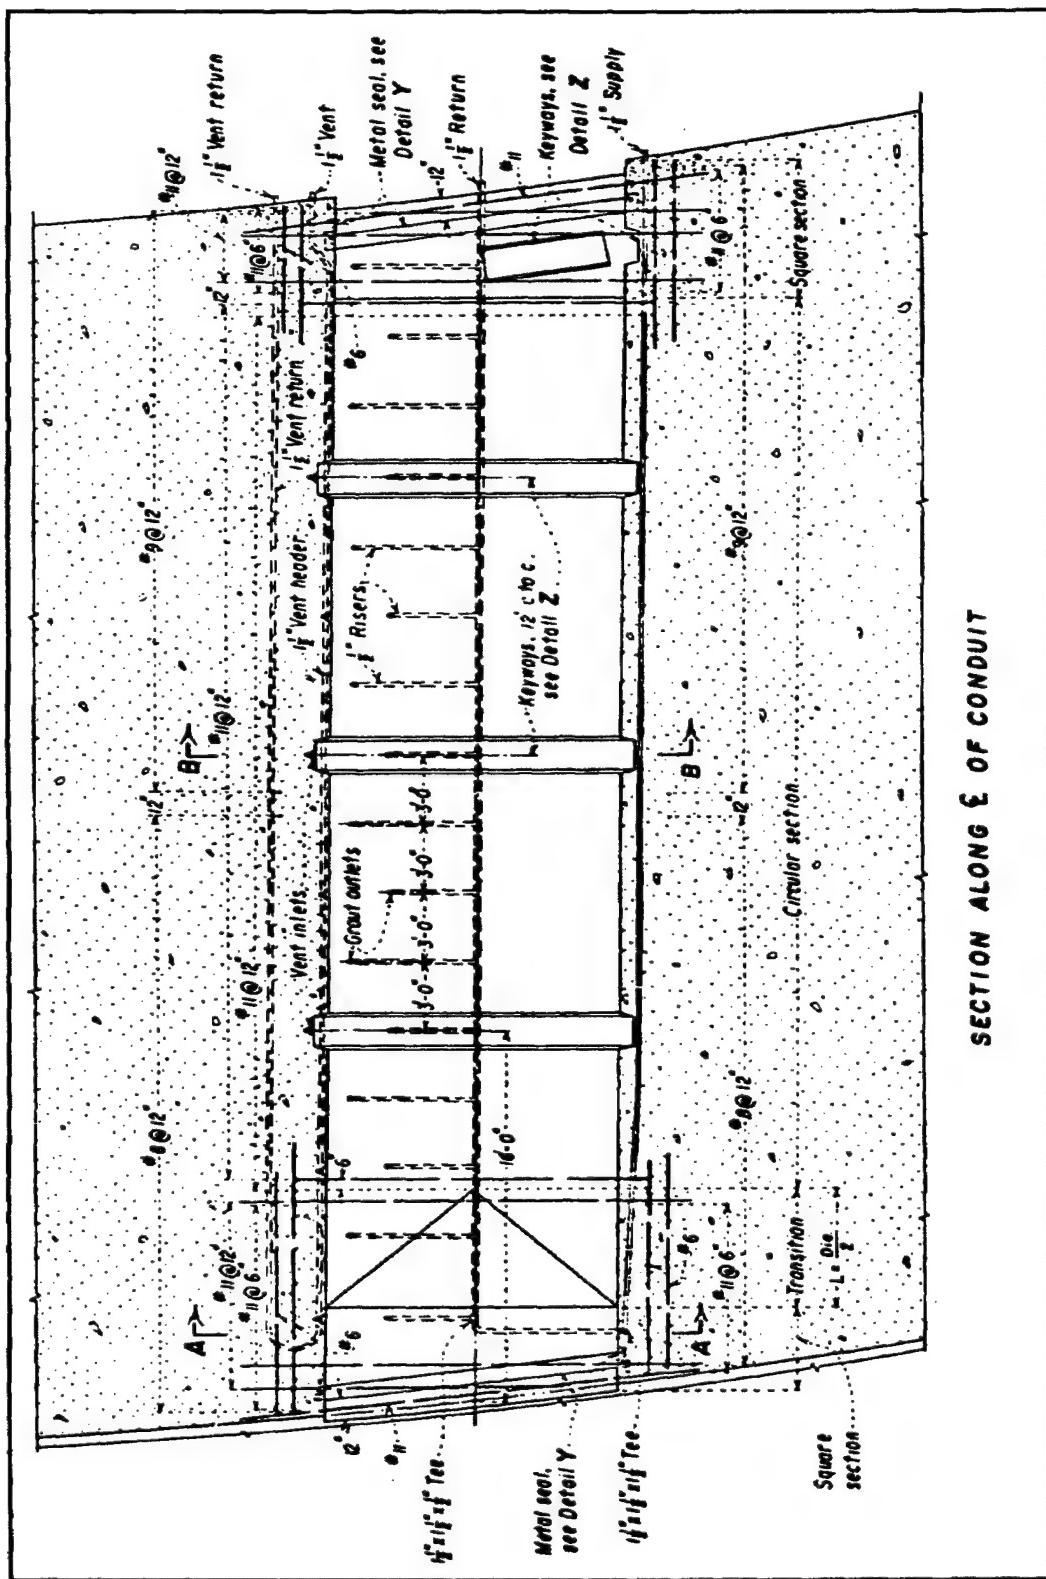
Diversion conduit through Morrow Point Dam (USSBR) (Continued)
